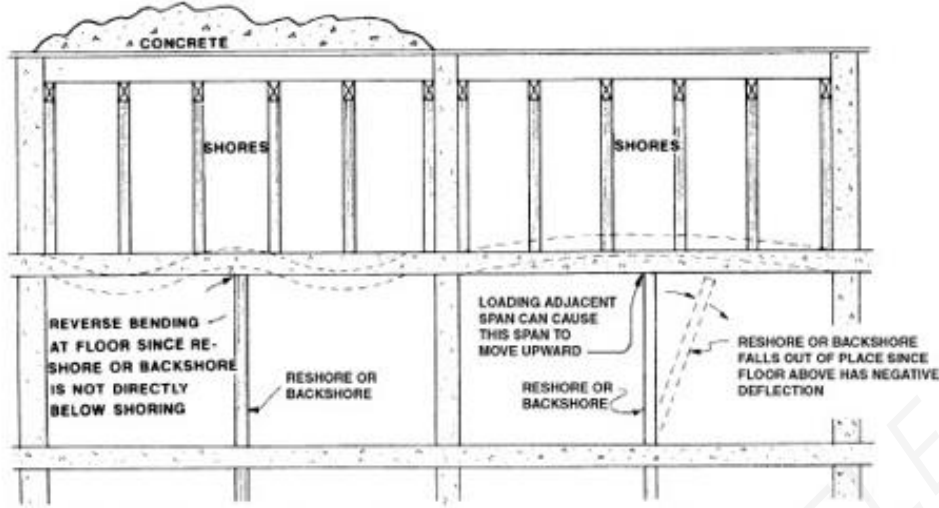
Reshore installation. Improper positioning of shore from floor to floor can create bending stresses for which the slab was not designed.
